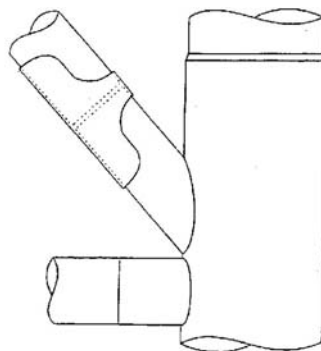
Wet welded scalloped sleeve to reduce overhead welding
